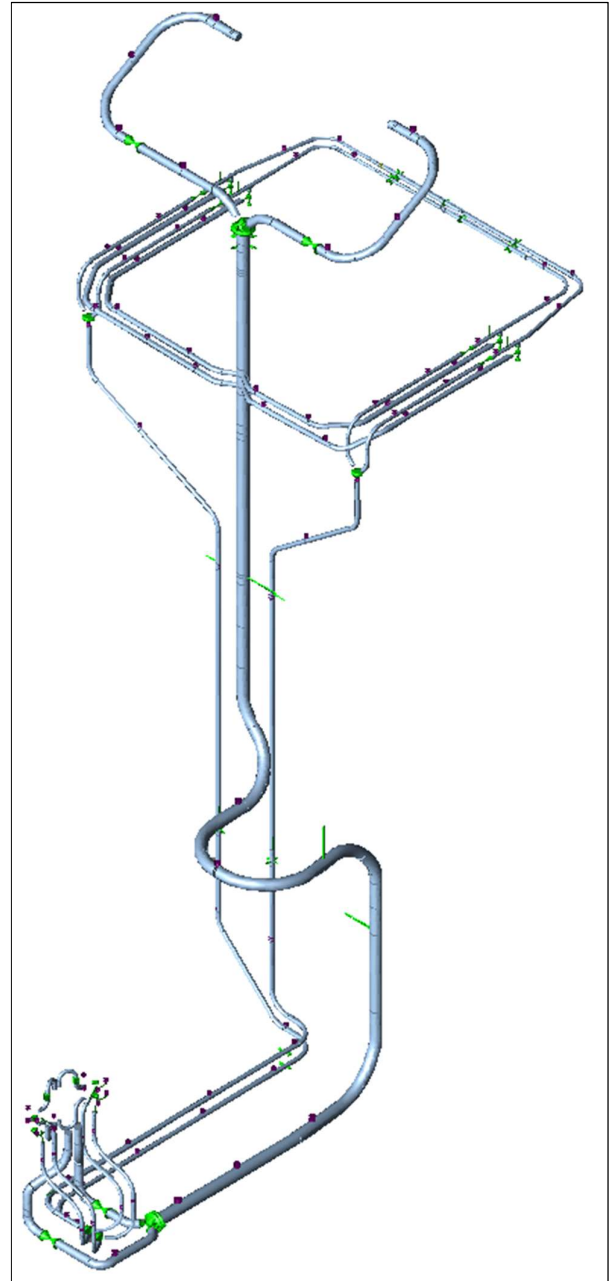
MODEL OF THE MAINSTEAM, HP BYPASS, AND HOT REHEAT PIPING LAYOUT.
